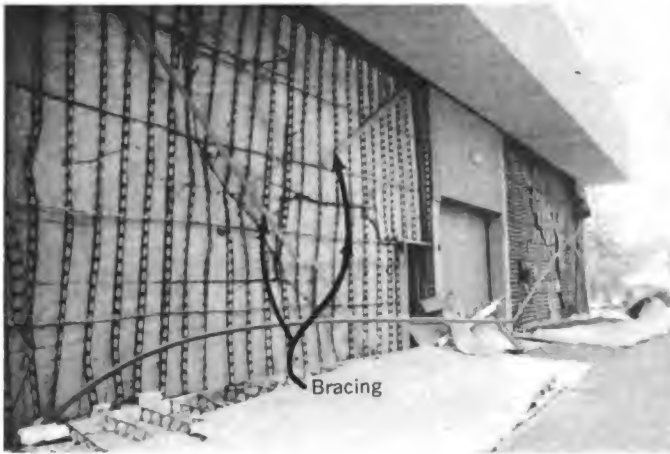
Olive View Hospital, heating and refrigeration plant. View of north wall, showing failure of diagonal bracing straps and plastered stud wall on ground.
